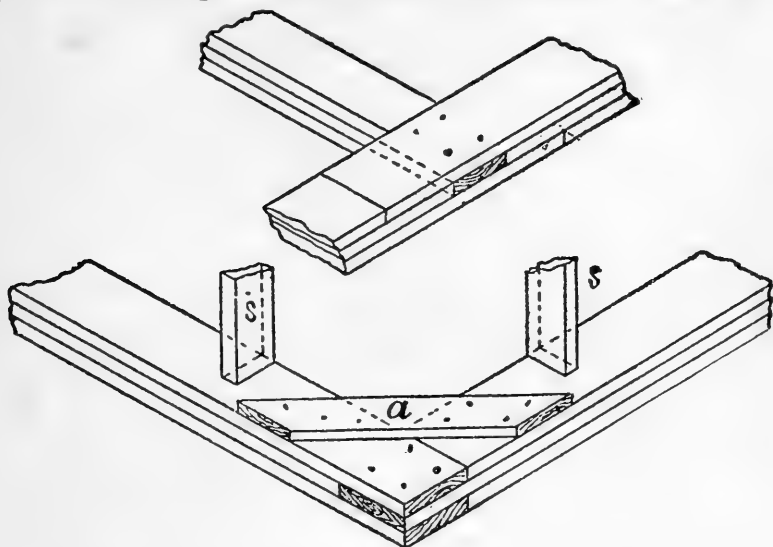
CONSTRUCTION OF CORNER JOINT AND CROSS-WALL INTERSECTION OF HORIZONTAL GIRTSILO. (GULLEY.)
